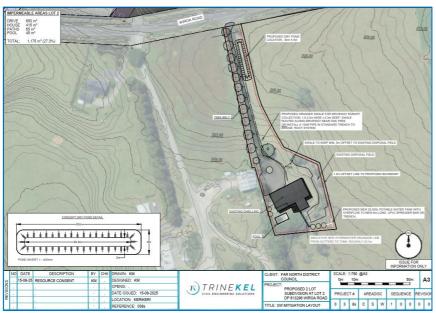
Stormwater Mitigation Layout Plan, showing location of existing on-site wastewater disposal field on Lot 2. Refer to Appendix 2 – Trine Kel Ltd Stormwater Technical Memo.
